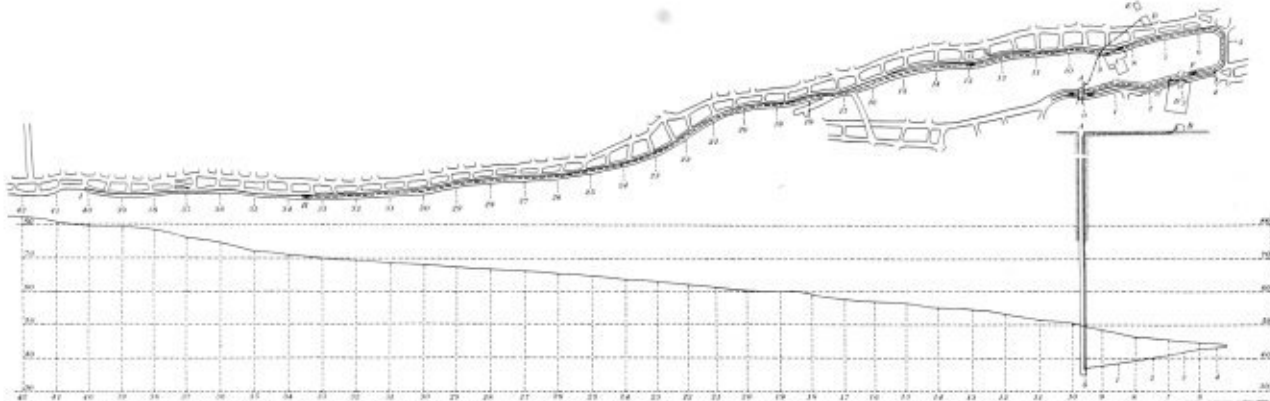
PLAN AND PROFILE OF HAULAGE ROAD. HORIZONTAL SCALE 1 IN. = 400 FT. VERTICAL SCALE 1 IN. = 40 FT.
